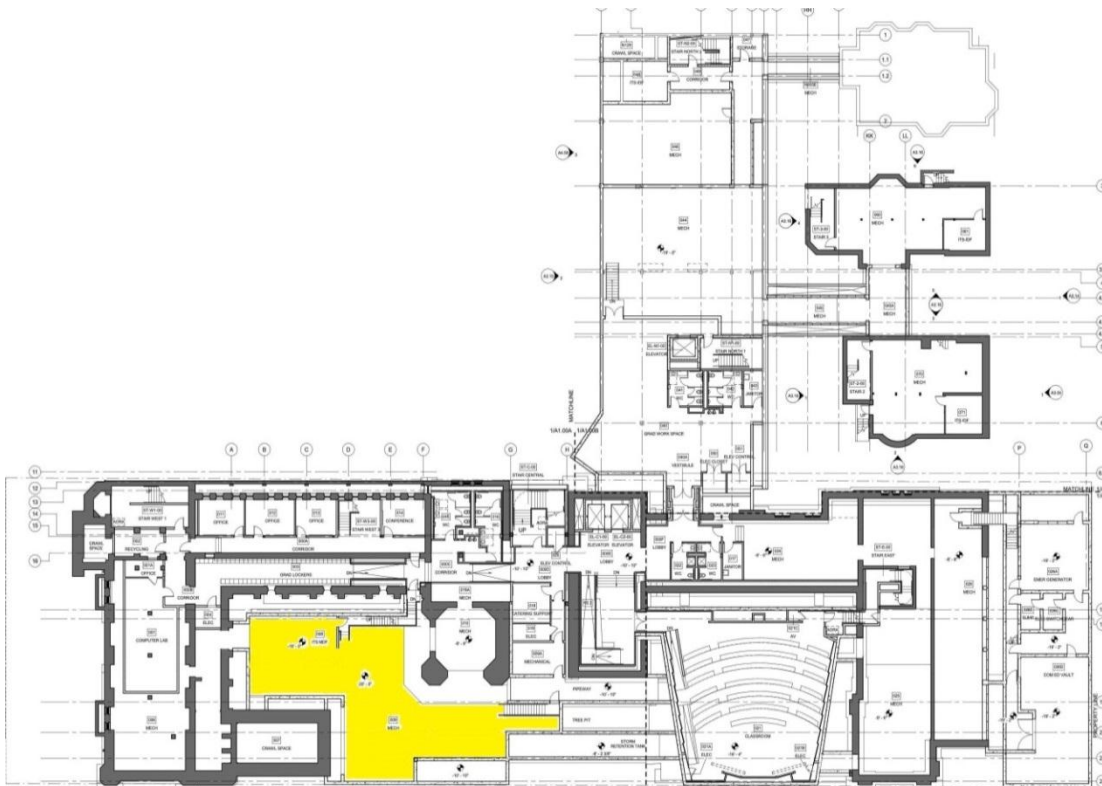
Basement Floor Plan (Plan-Issued for Construction, 2012)
